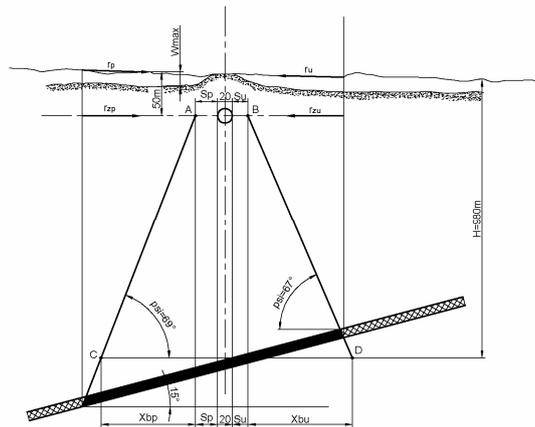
Geometry of safety supporting pillar below the traffic tunnel
